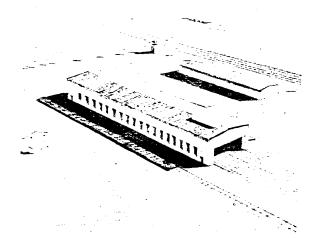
CONCEPT OF RAIL-THROUGH BUILDING AT FACILITY NO 1.
